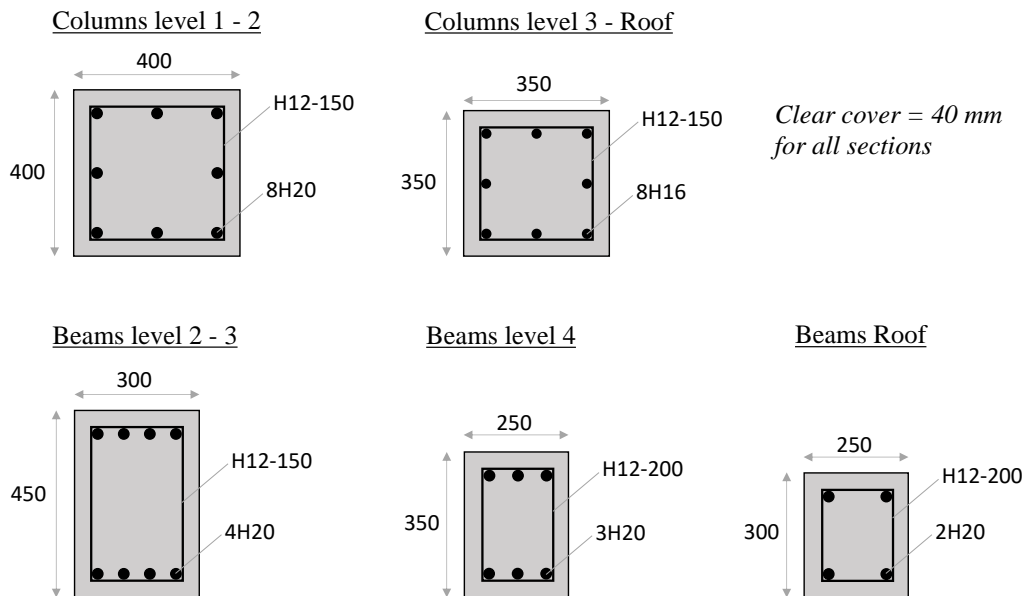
Cross-section layouts of the columns and beams of the superstructure RC frame (units in mm)
